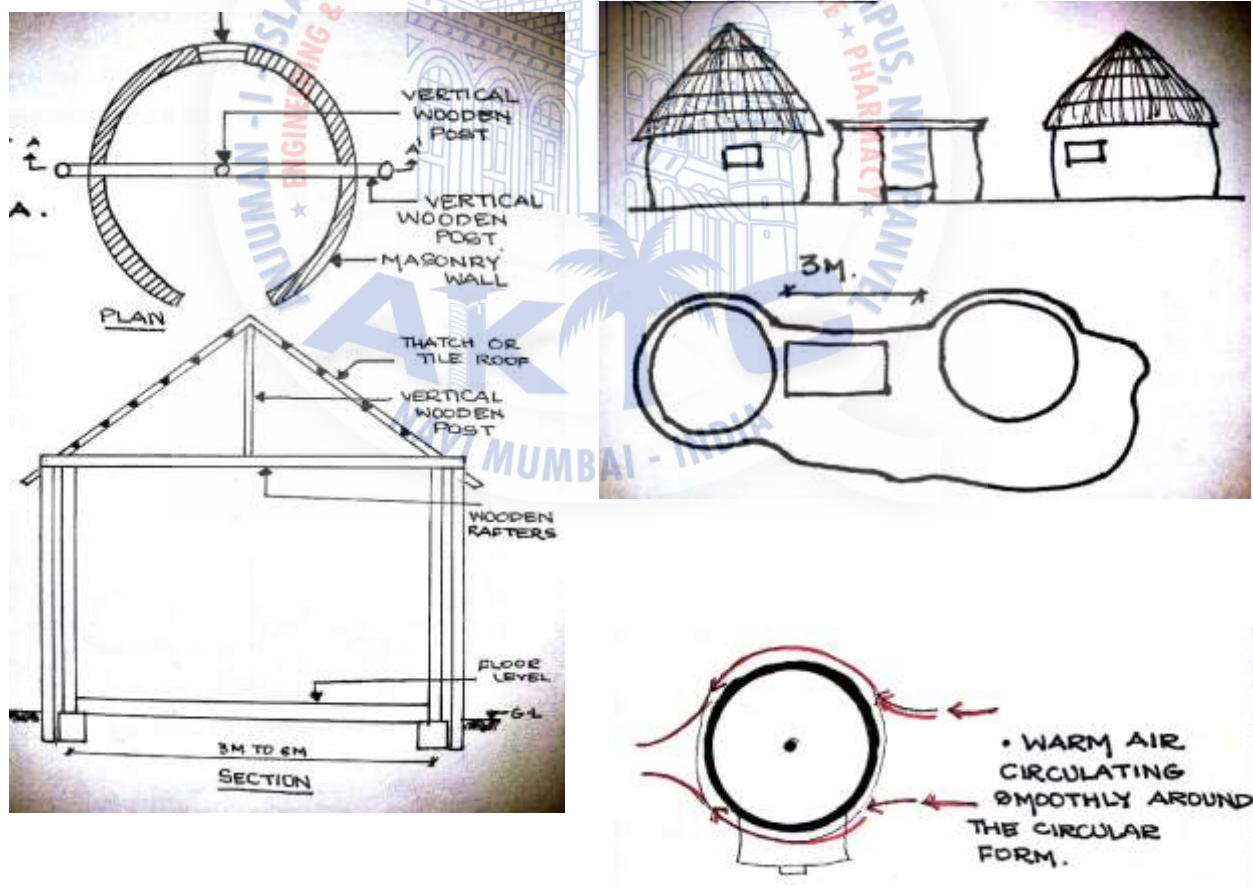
, 37 and 38: The plan and section of a typical Bhunga house and its construction
